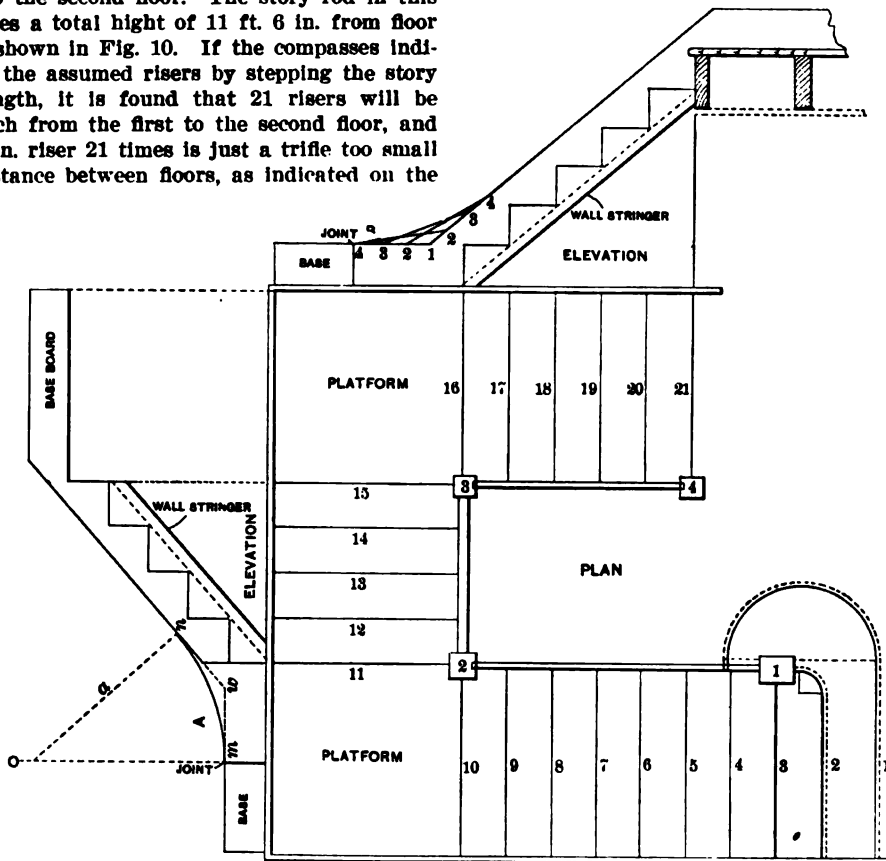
Plan of a Newel and Platform Stairway; Also Elevation of Wall Stringers.
